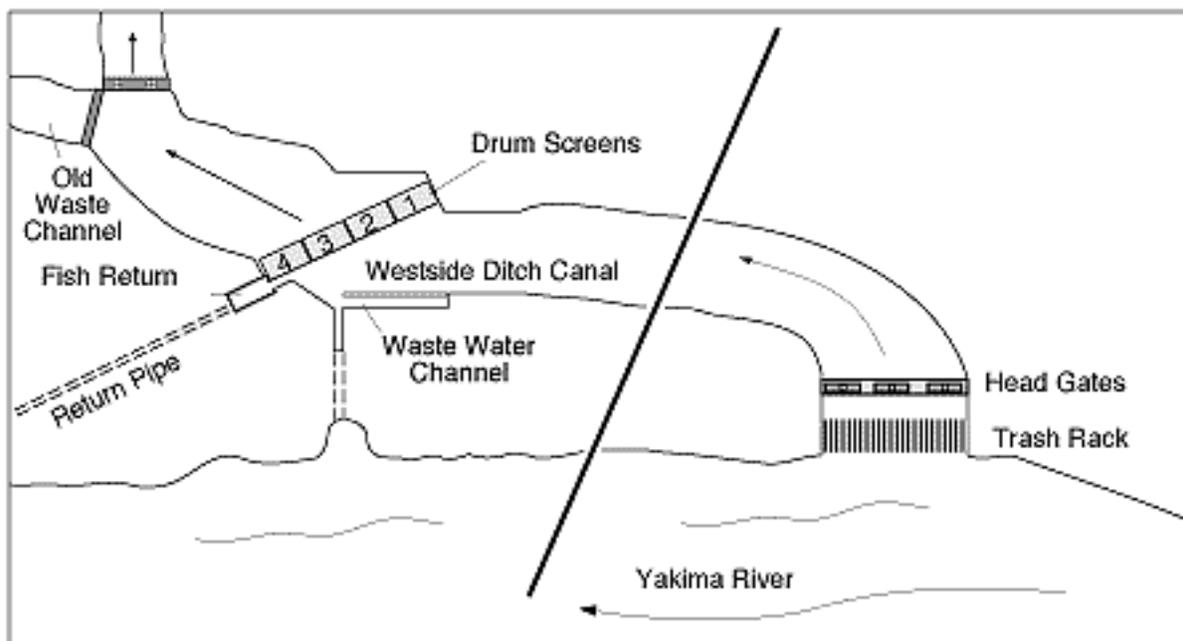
Flow Control Structure and Fish Bypass System in the Westside Ditch Canal Fish Screening Facility
